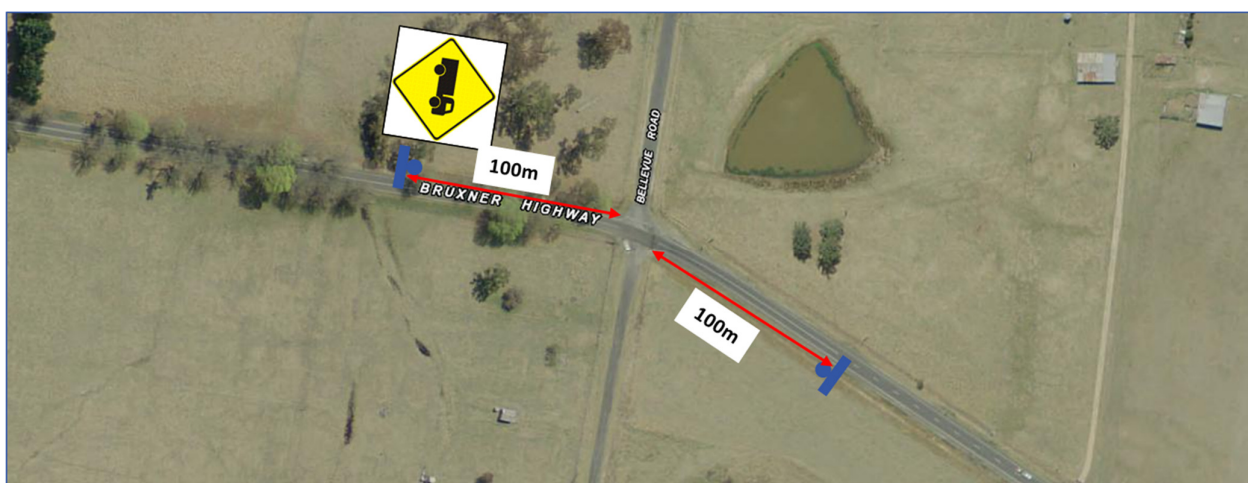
Truck crossing signs at the intersection of Bruxner Highway and Bellevue Road
